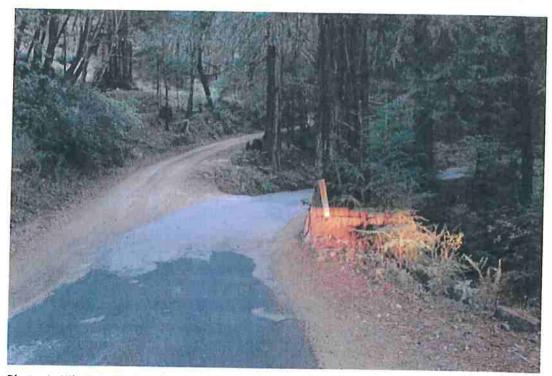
Mile 0.1: Pinch point at tree: 15-ft road width with 1-ft shoulders, decent visibility.
